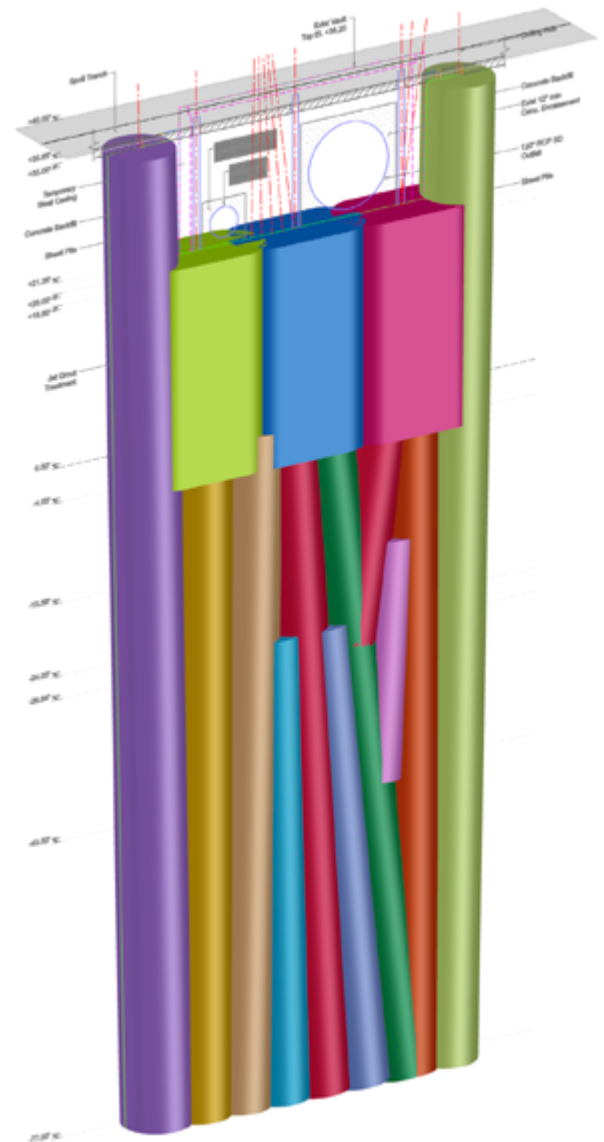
| Pioneer Reservoir Outfall Crossing S1 panel execution
